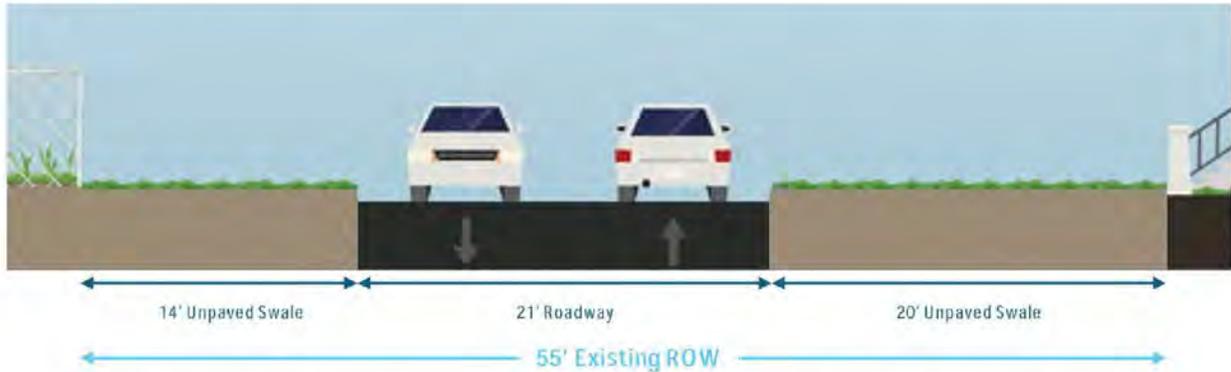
Existing Cross Section for NE 208th Street, west of NE 28th Avenue
